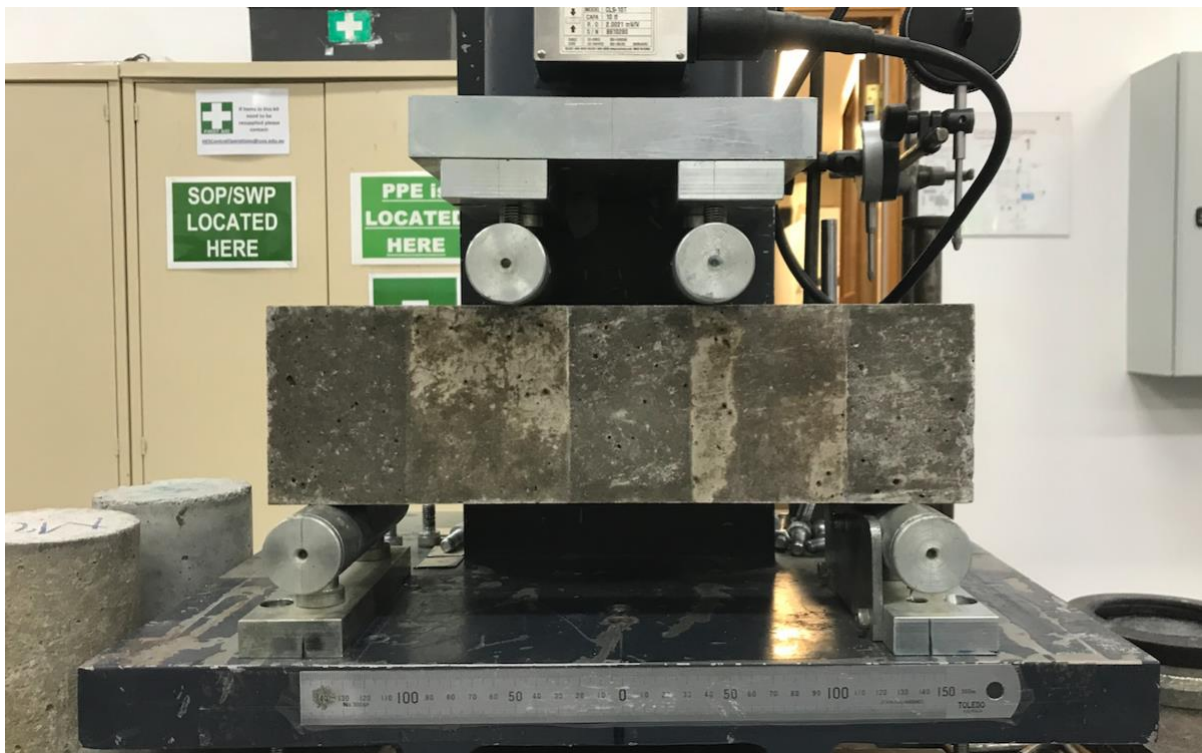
Flexural strength test specimen ready for testing in compression machine.
